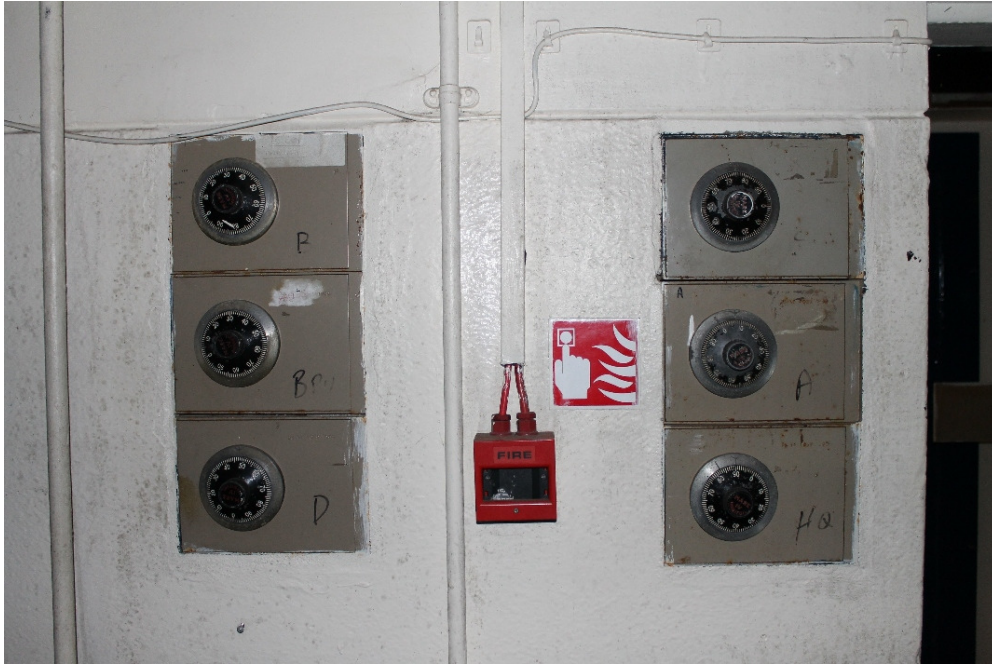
MEE 01 detail of the gun safes embedded in the day reception wall – view west
